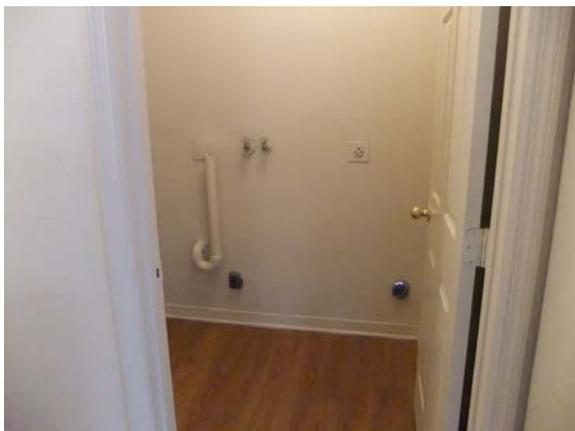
CLOSET WITH WASHER/DRYER HOOK-UP
